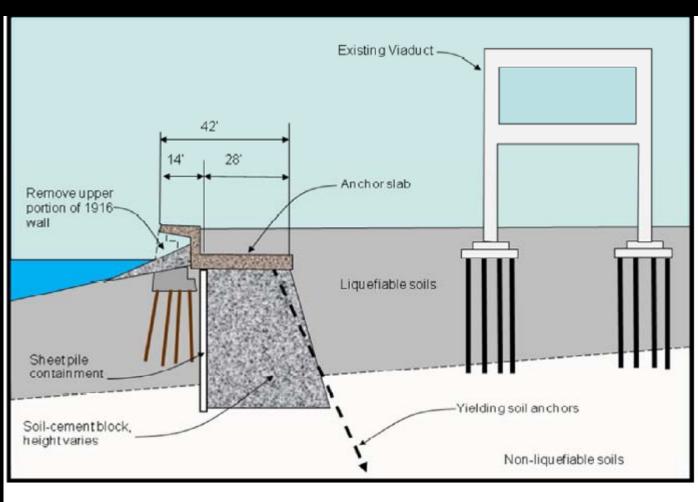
Proposed Anchored Soil Improvement Concept at the 1916 Wall
